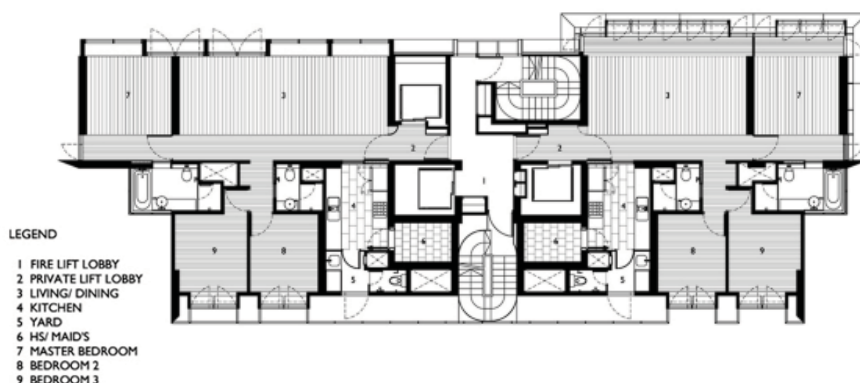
Moulmein Rise: Typical Storey Plan © WOHA
